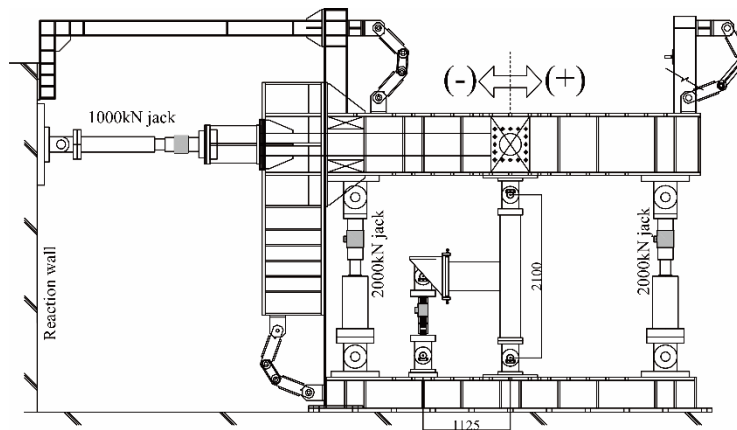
summarizes the structural tests on typical beam-column joints in Bangladeshi RC buildings performed in the SATREPS-TSUIB project<sup>1)</sup>. The specimens were 70% scale models representing two types of typical beam-column joints in Bangladesh: Figure 4a with straight anchorage at the end of beam deformed rebar used after 1995 (hereafter J1) and Figure 4b with 180° degree end hook at the end of beam plain rebar used before 1995 (hereafter J2). Figure 5 compares the test results between both specimens applied static cyclic loading by the apparatus shown in Figure 4c. The specimen J1 showed more brittle behavior in the negative loading direction with pull-out failure, as shown in the photograph, while the lateral resistance gradually degraded with joint shear failure in the positive loading direction. The pull-out failure initiated at a drift angle of -1.5% rad, thus the ductility limit,  $F_{limit}$  was proposed at 2.2 consistent to the 1.5% drift angle. In addition, an initial yielding of the beam longitudinal rebar was observed during the loading cycle to 0.75%; thus, the beam ductility ratio at the pull-out failure was approximately 2.0, which was consistent to the  $F_{limit}$  of 2.2. On the other hand, the specimen J2 behaved in a similar manner to that of J1 in the positive loading direction showing joint shear failure. The ductility of J2 was 4.0% rad ( $F > 3.2$ ); thus, the evaluation of joint shear failure was not considered in this procedure. Furthermore, the specimen J1 was modeled and analyzed using FEM. Bond strength on the FE model was determined using the design formula by equation (4)<sup>2)</sup>. The analytical result is compared to the experimental one in Figure 6. The FEM analysis reproduced similar brittle pullout failure which was observed in the experiment, while the estimation was conservative in both loading directions. Thus, the pull-out capacity of the beam was conservatively evaluated by the FE model applied the bond strength by
